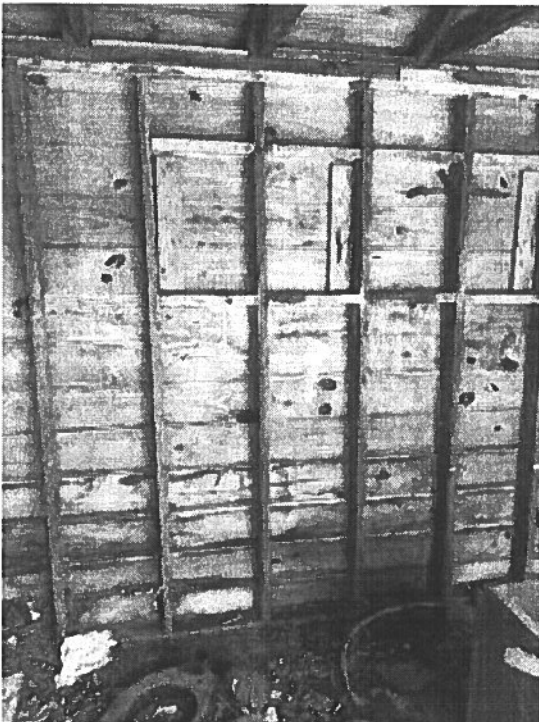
Wall Section with Multiple Signs of Fungus Infestation
